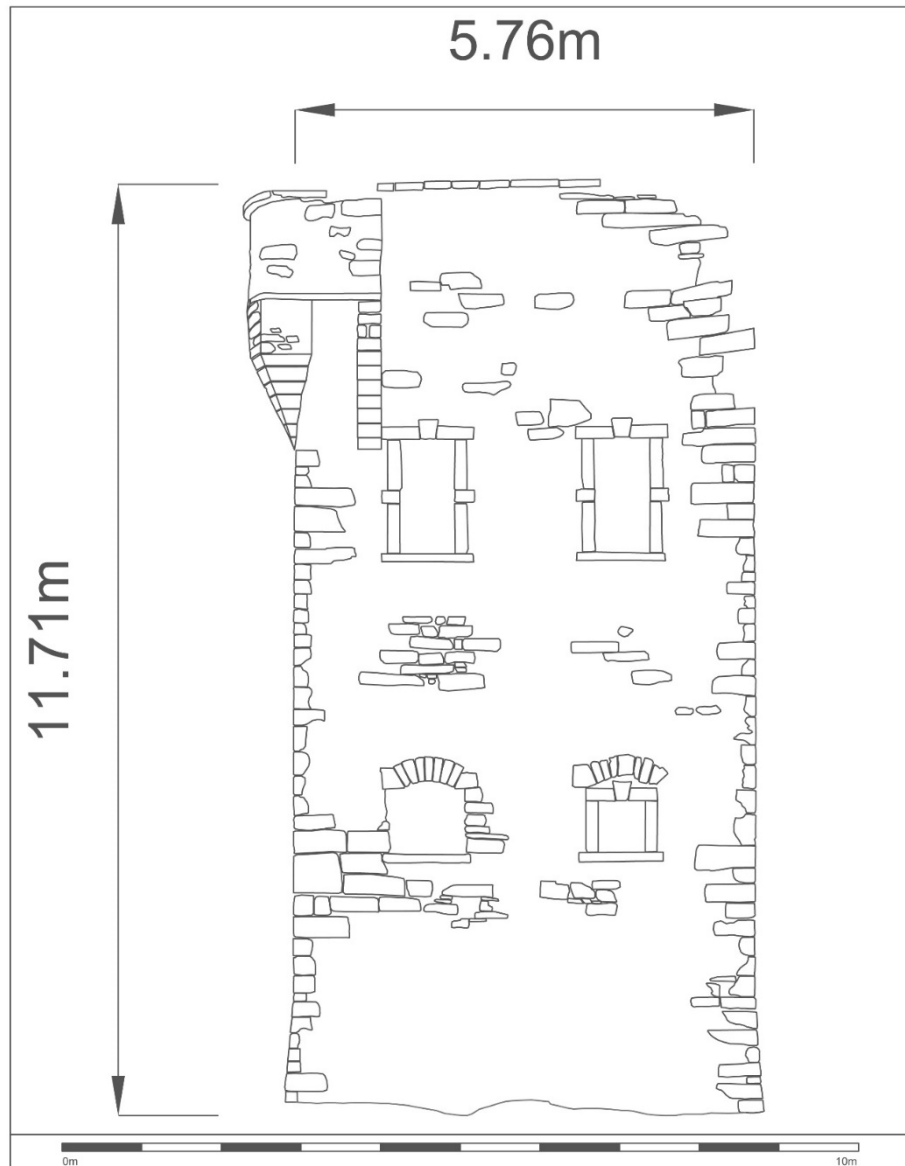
External elevation of the north-east wall of the signal tower at Glen Head Signal Tower.
